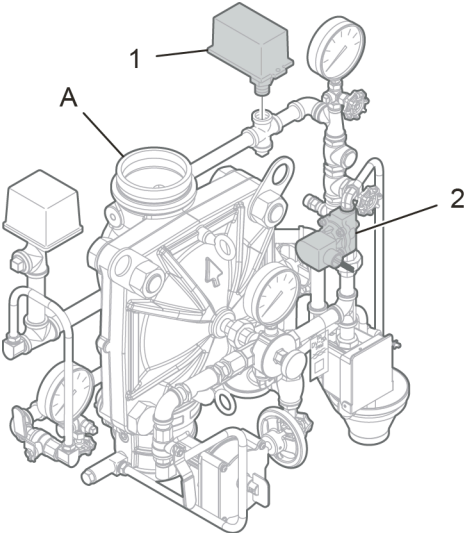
DV-5A preaction valve with Model QRS-2 Electronic Accelerator and releasing panel riser arrangement
